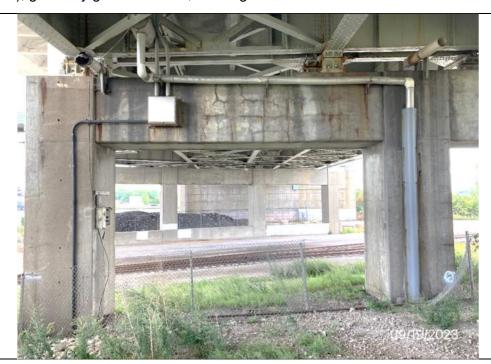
[Pier 8] -Drainage troughs are not connected to downspouts at pier and downspouts have missing segments, Looking South
